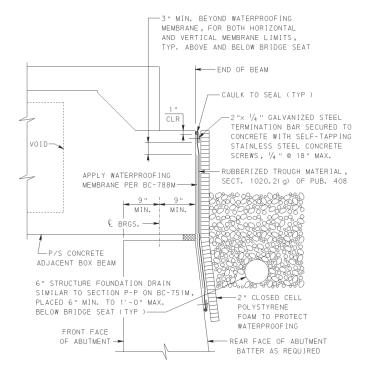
Typical representative waterproofing detail for parapet abutment
